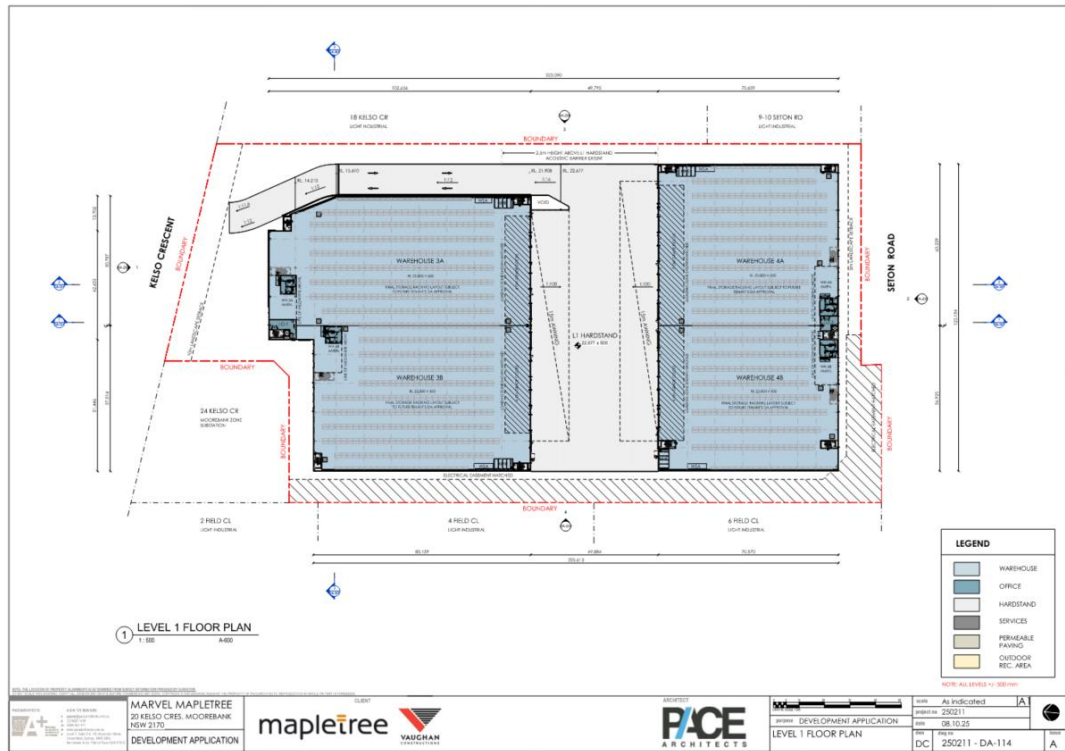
Proposed Development – Level 1 Plan (Source: Pace Architects)
